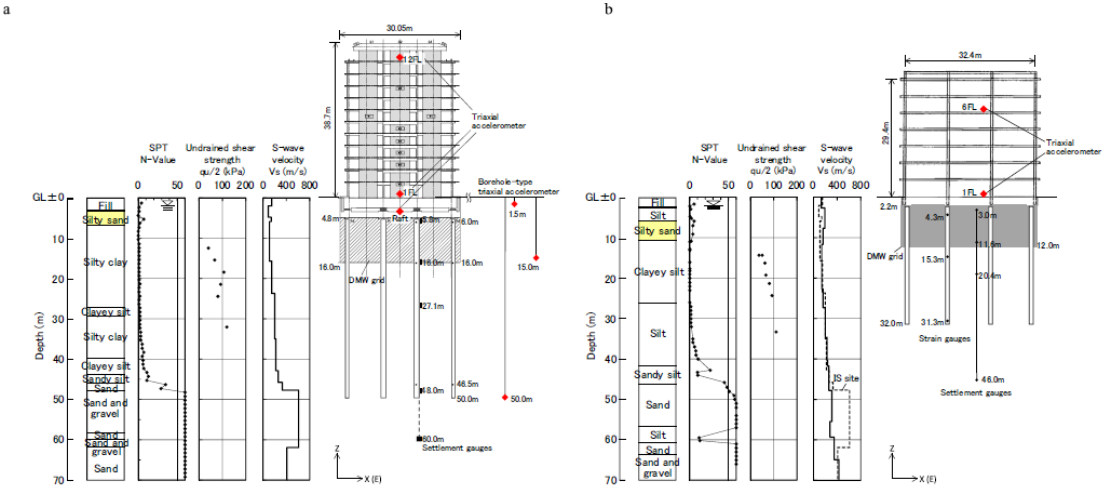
Transverse views of (a) 12-story base-isolated building (IS building) and (b) 7-story non-isolated building (NI building) with soil profiles and locations of monitoring devices.
